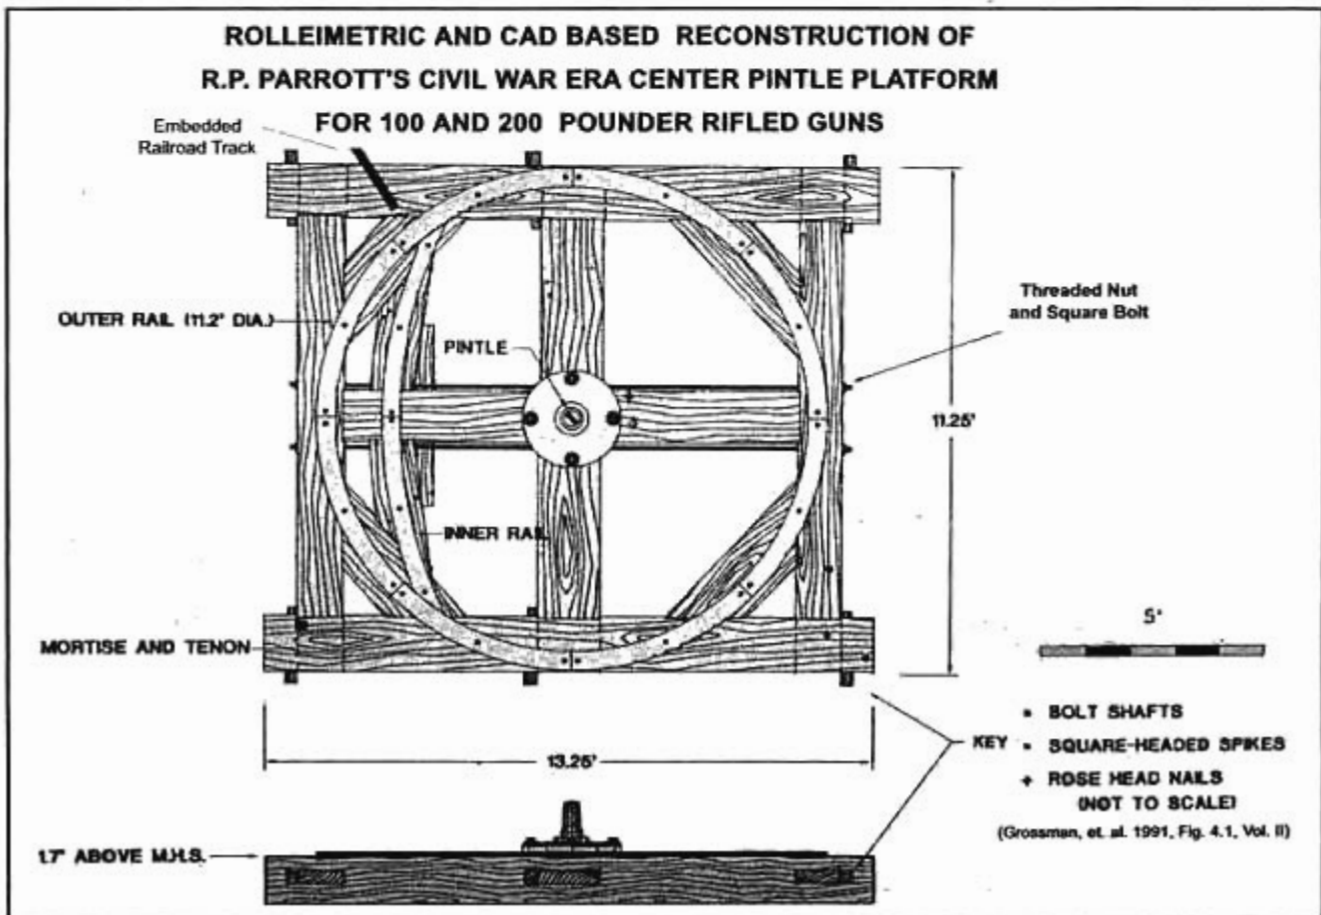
Final-scaled AutoCAD plan and profile record of excavated Civil War cannon-firing platform drawn from Rolleimetric photos.
